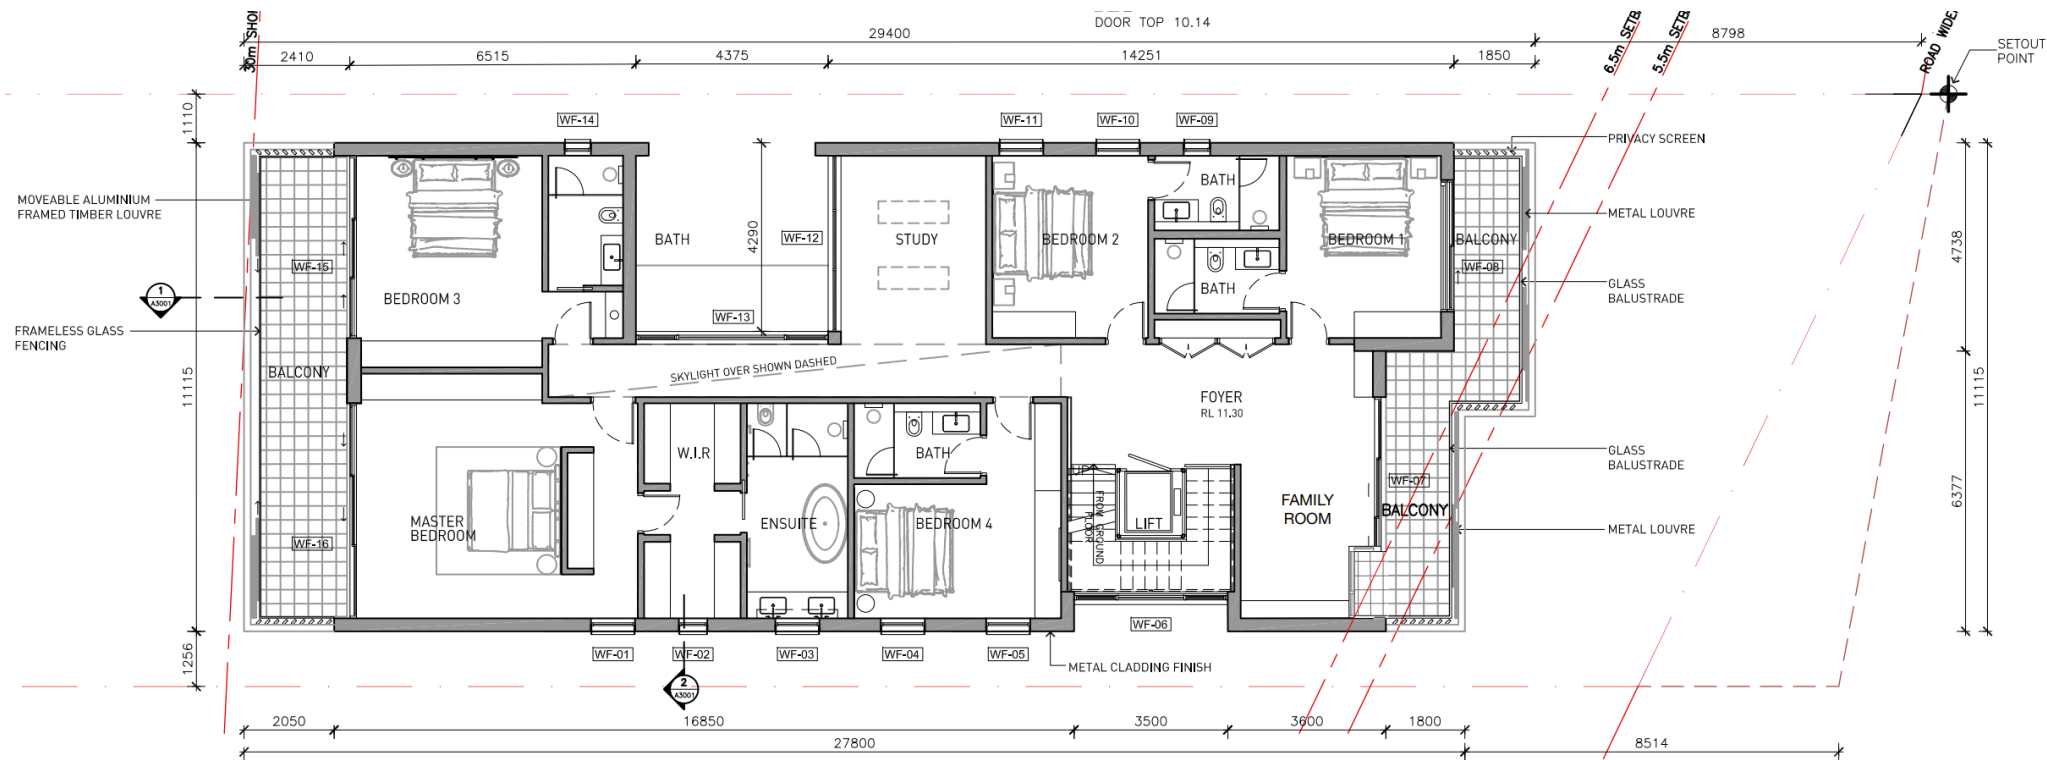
First Floor Plan for DA-667/2017/A prepared by PTW Architects.
